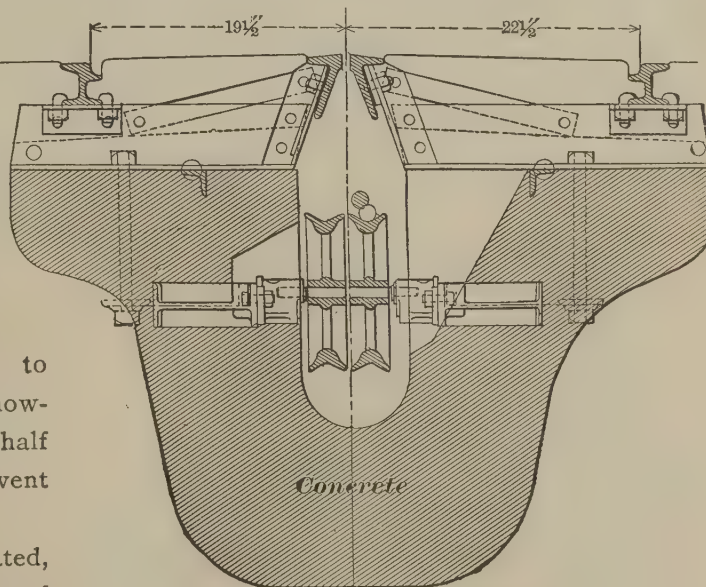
LIGHT SECTION—ISAACS' CONCRETE ROAD BED, OAKLAND, CAL.
